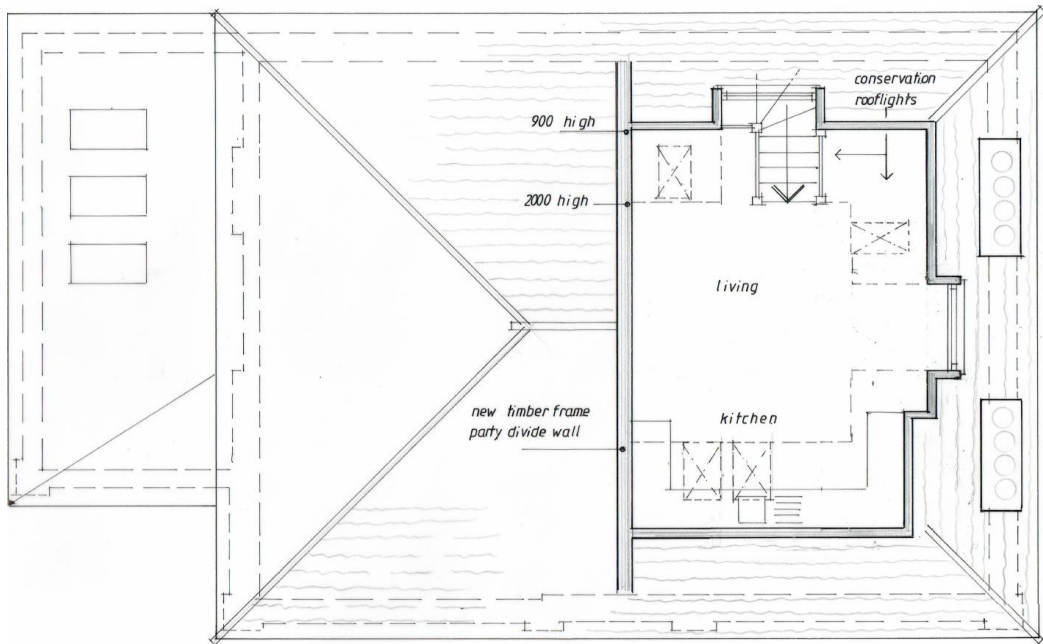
now proposed roof plan arrangement showing the addition side dormer window between the chimney stacks and slightly repositioned approved single conservation roof light. Source: Allen Smith Associates.
